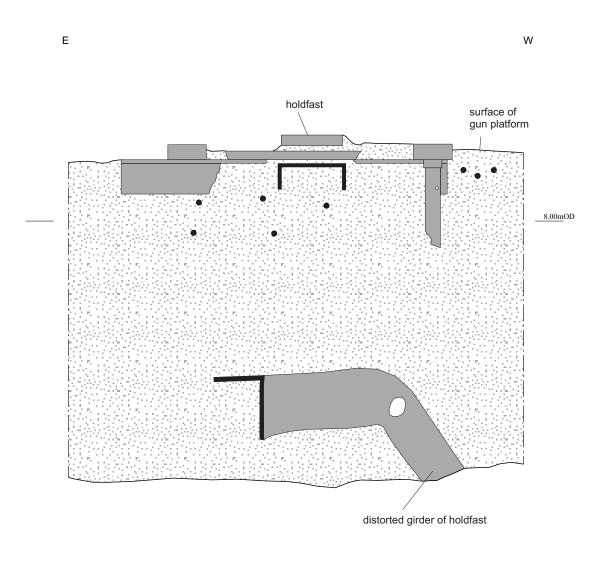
North-facing S5 of gun platform, Building 14, showing detail of holdfast
